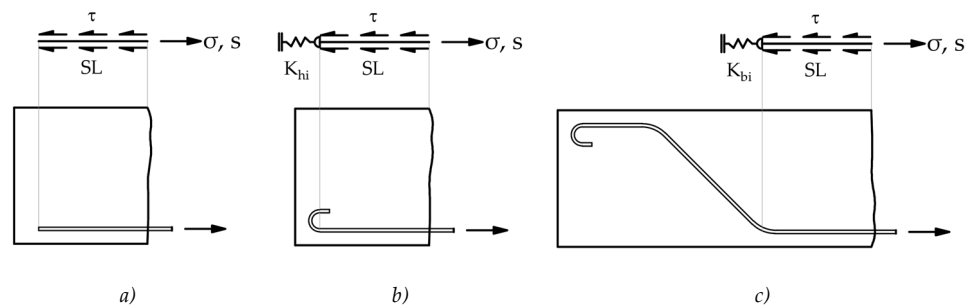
Approach to the modelling of smooth bar anchoring in a concrete block: only straight length (SL) a), hook-end anchoring device b) and bent rebar (c).
